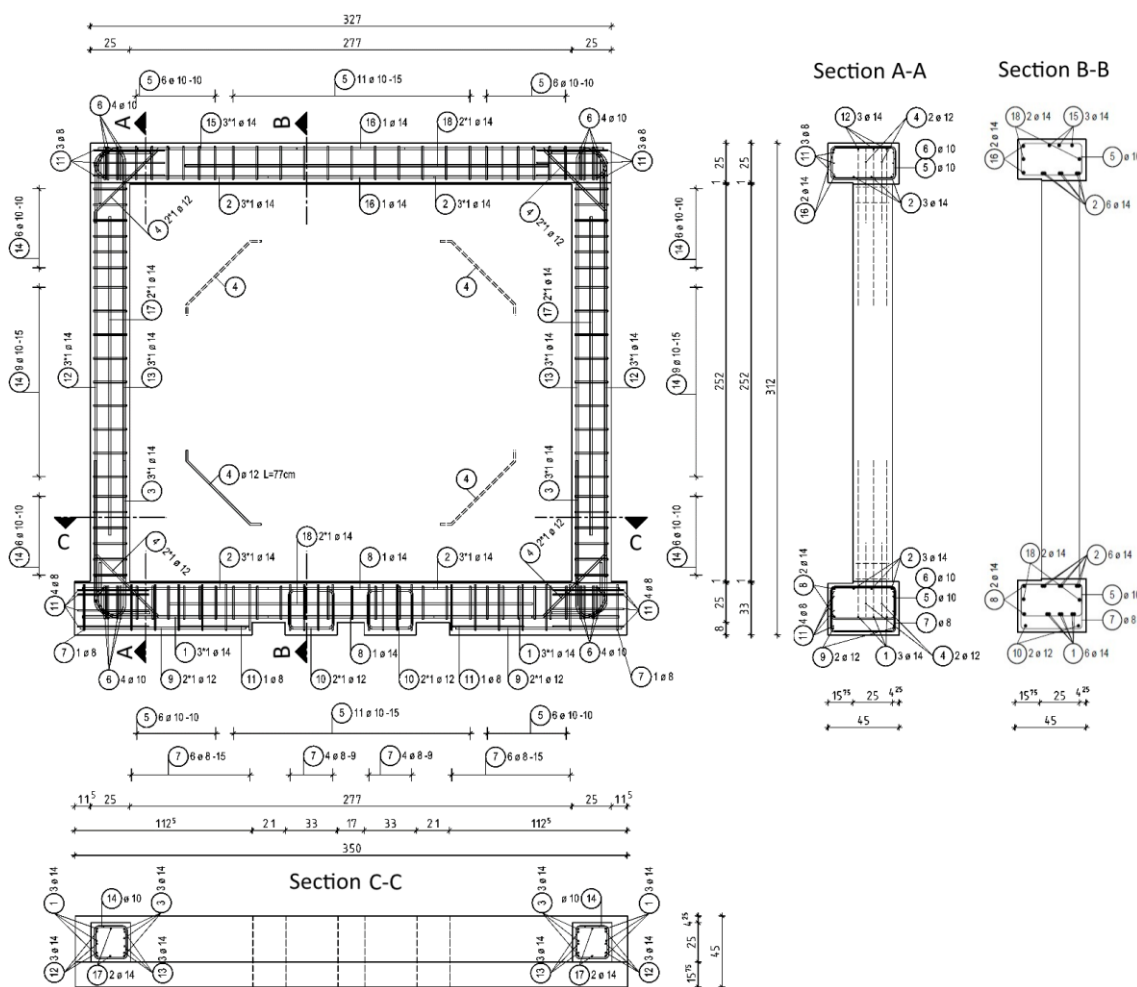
Dimensions and reinforcement of the RC frame (test A, BI/BO and BIO) (IN-SYSME, 2017b)
